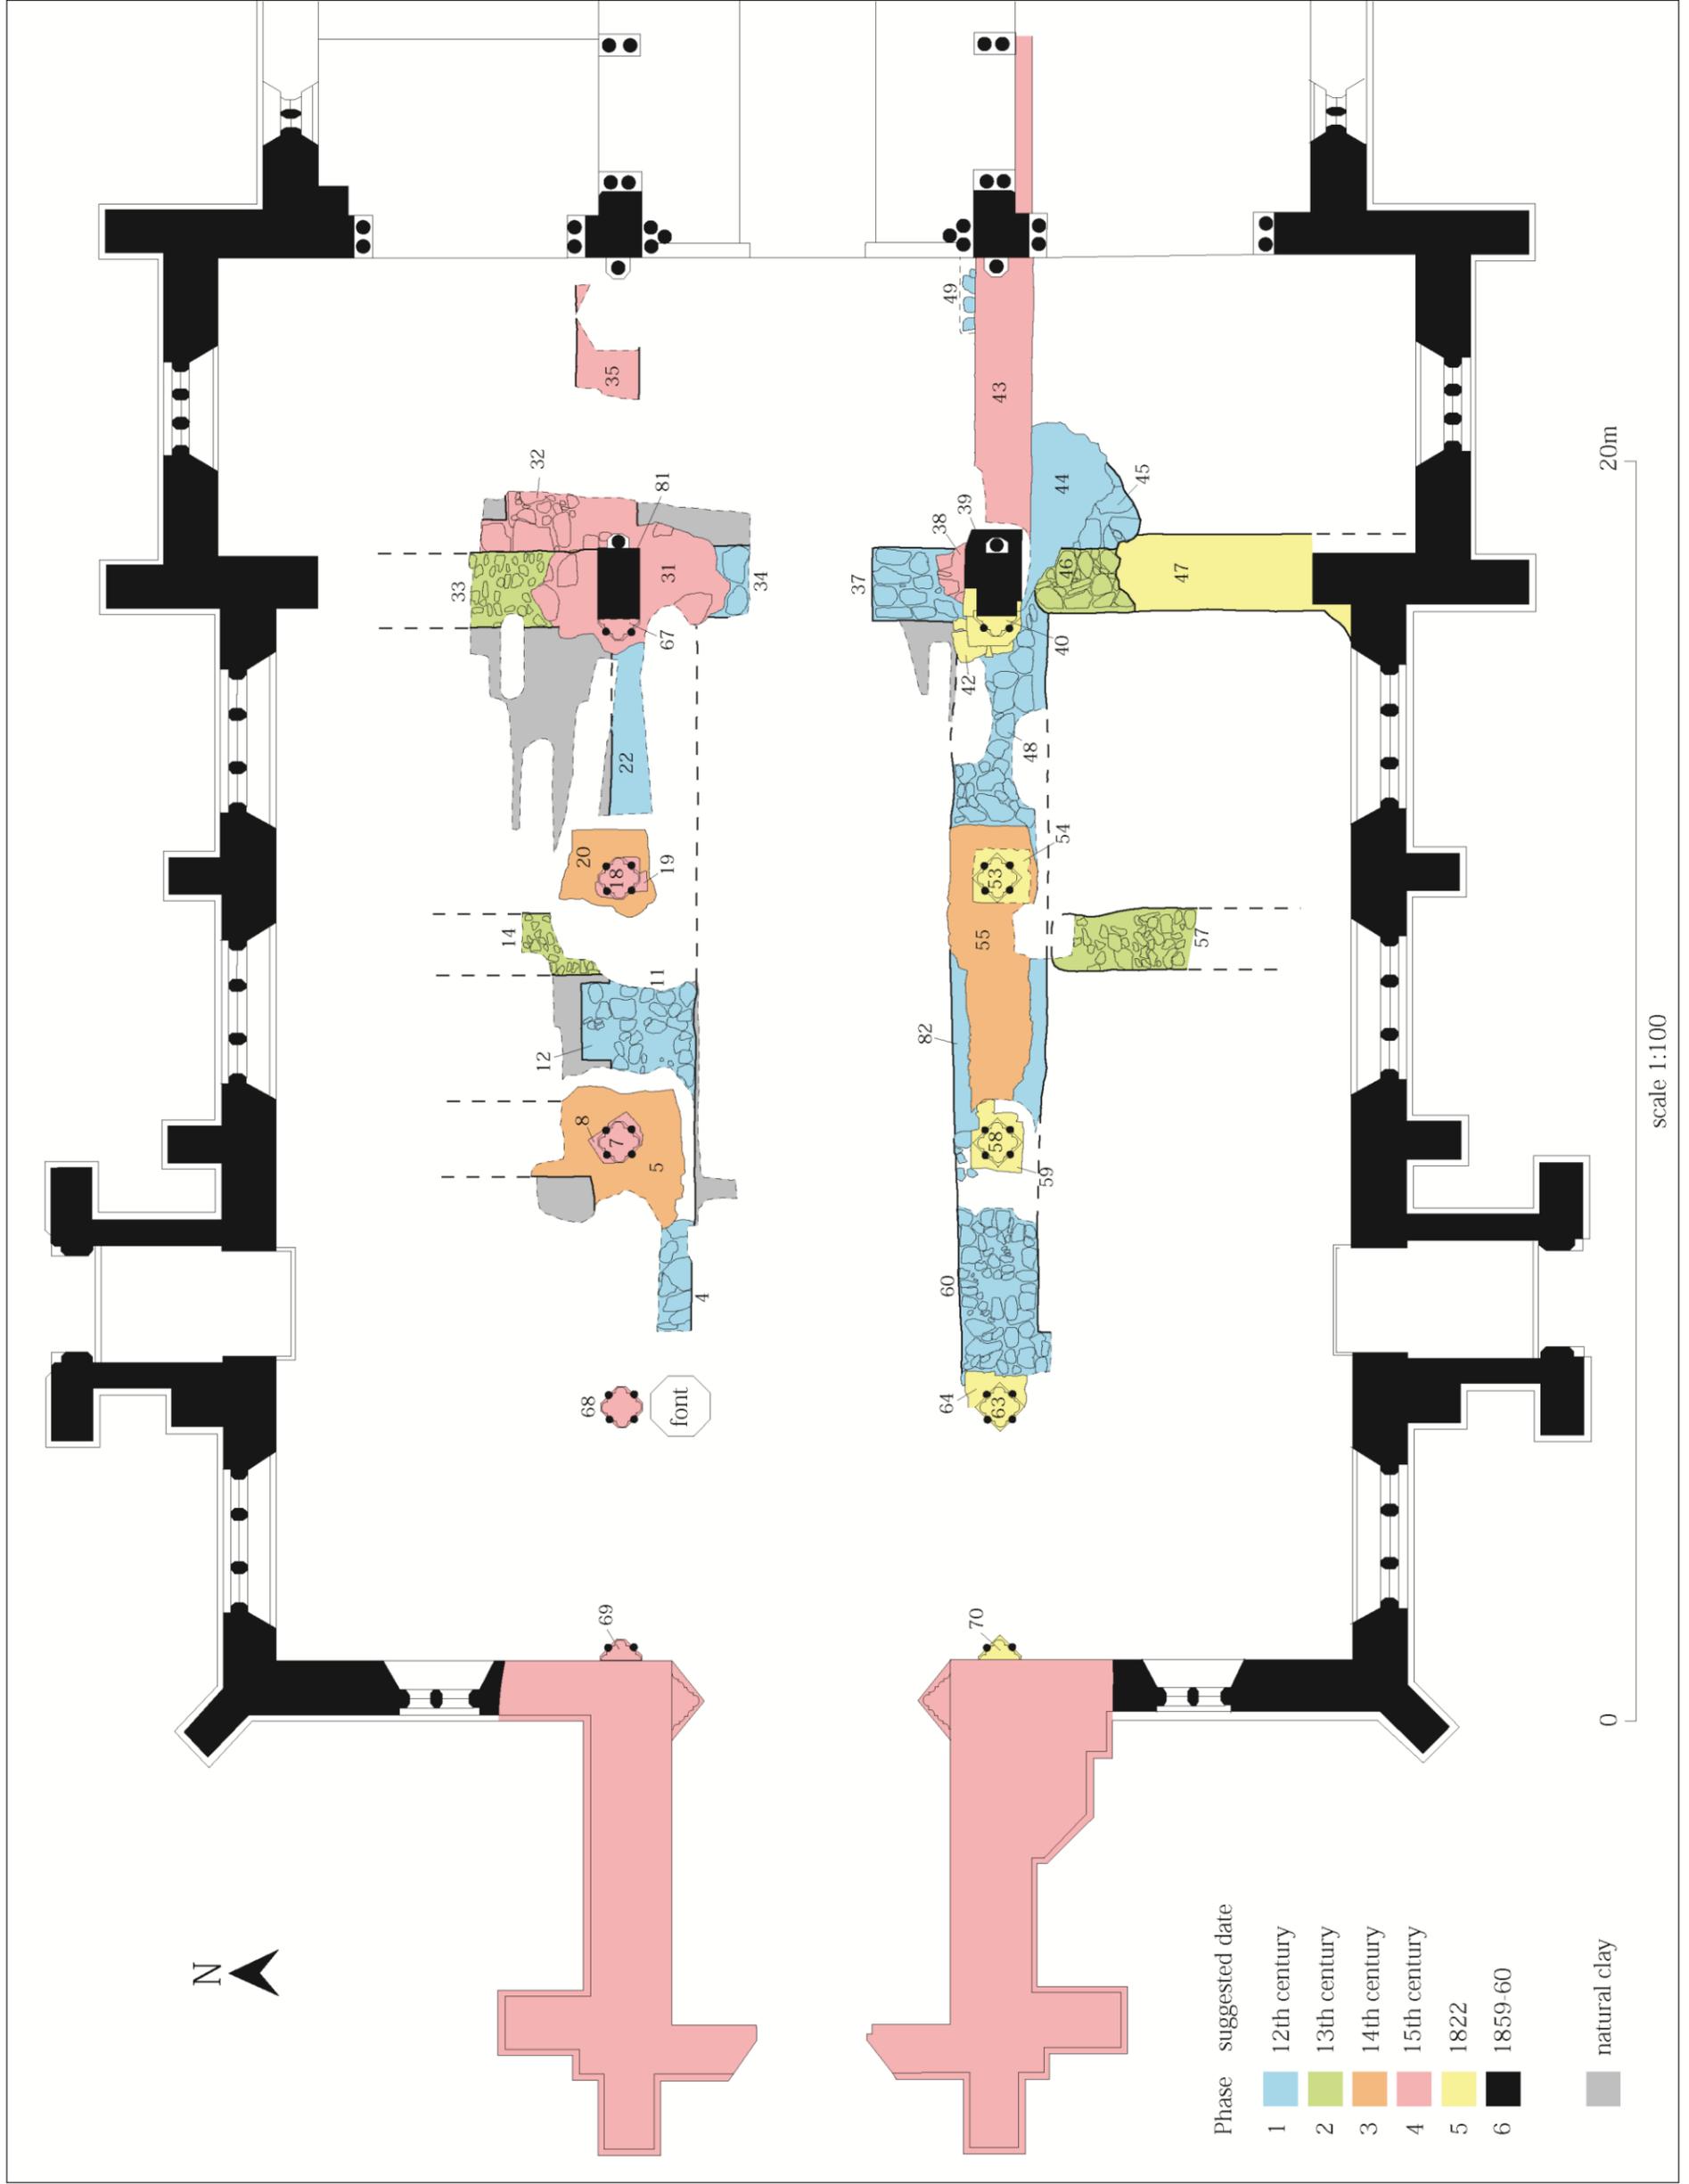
Plan showing located masonry wall foundations and their phasing.
